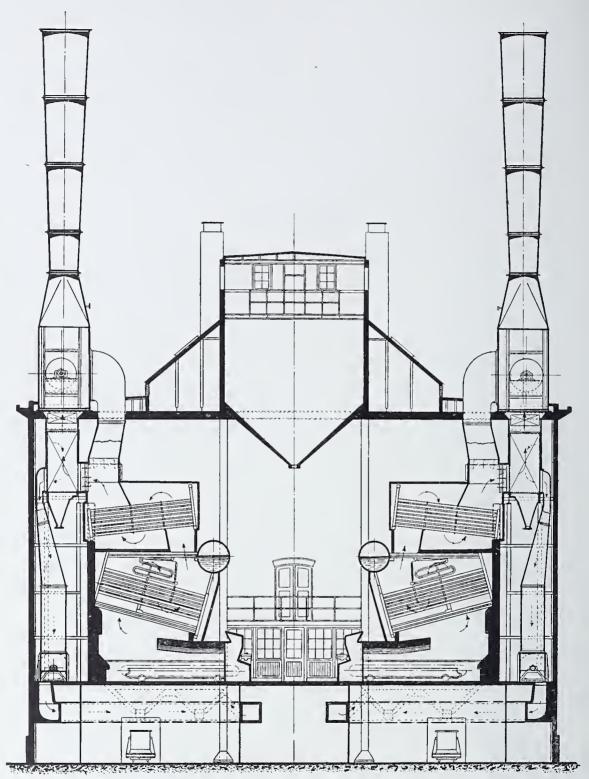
Cross Section through Boiler House at a Generating Station, showing Arrangement of Prat Draught and Thermix Air Heaters.
